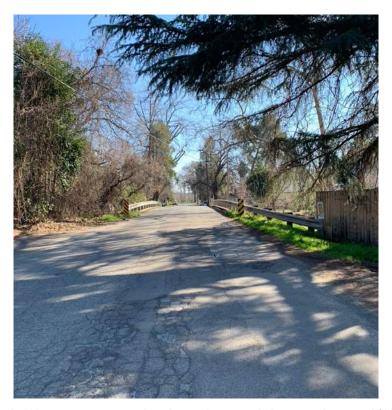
Western approach, viewed toward the southeast. 2/6/2020.
